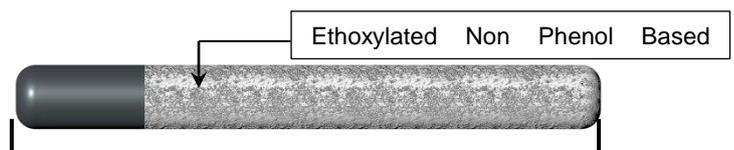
Ethoxylated non Phenol Based Adhesive Applied on the foundation beam
